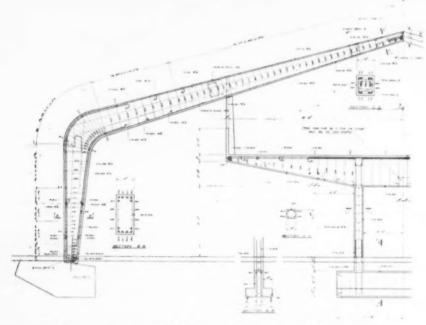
Part Cross Section through Warehouse and Canteen.
